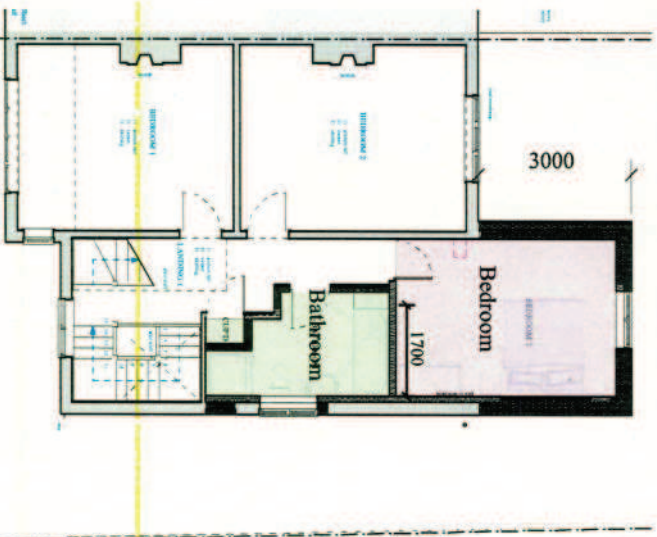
Alternative first floor plan with a larger two-storey extension showing how the first floor could be extended within permitted development rights
